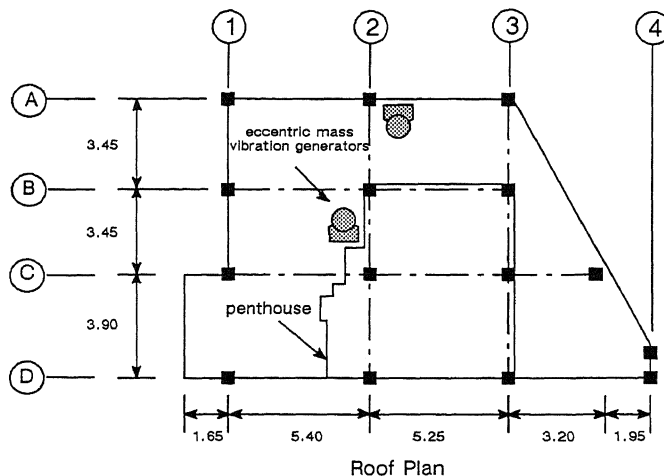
Roof Plan of Building Showing Location of Vibration Generators
